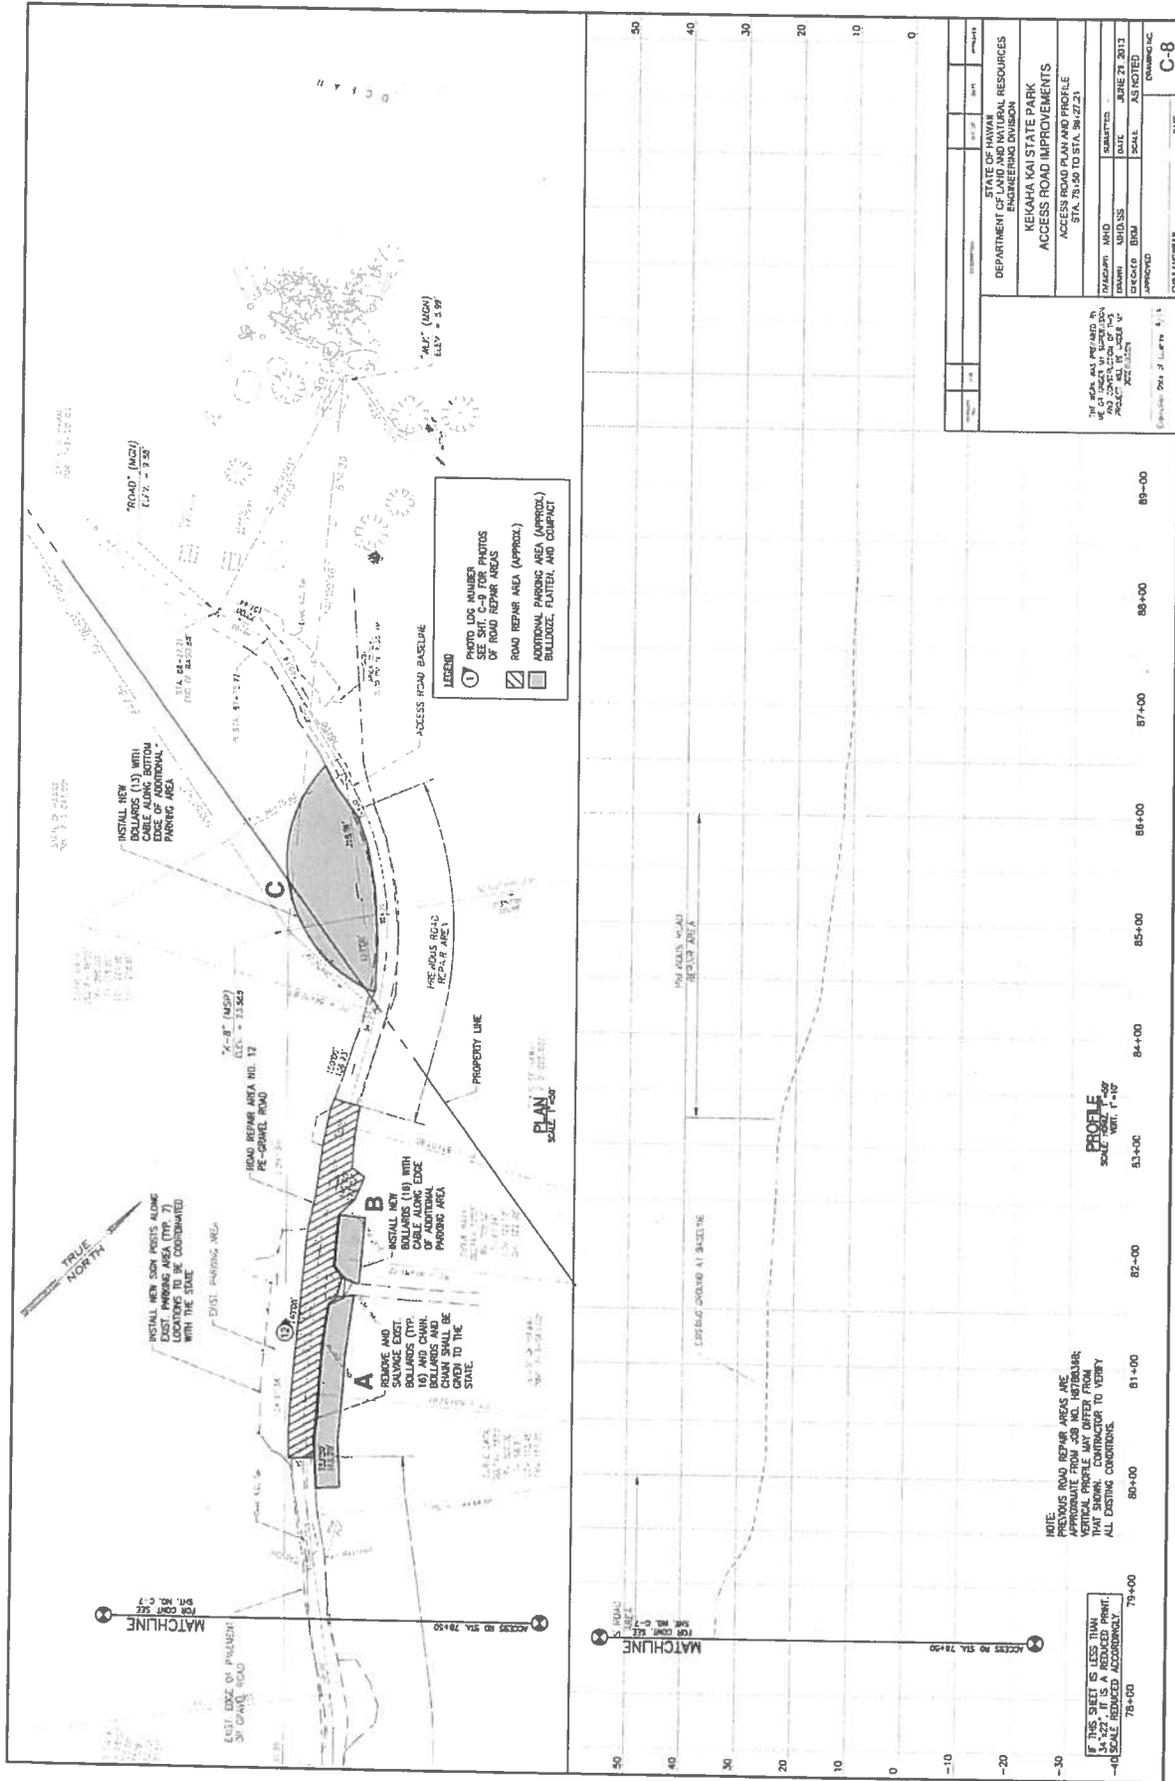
Construction plans for the parking improvements along the park entry road to Mahai'ula.
